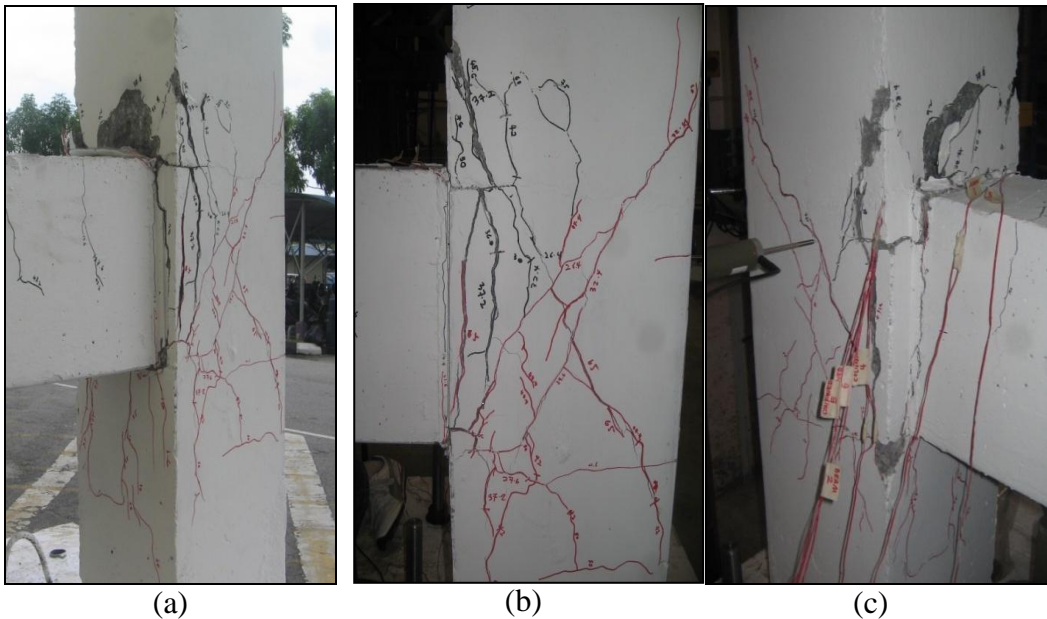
Visual observation on the damage of Specimen 1; (a) spalling of concrete on surface of column ; (b) diagonal cracks from top to bottom of column; and (c) spalling and cracking of concrete cover of column.
